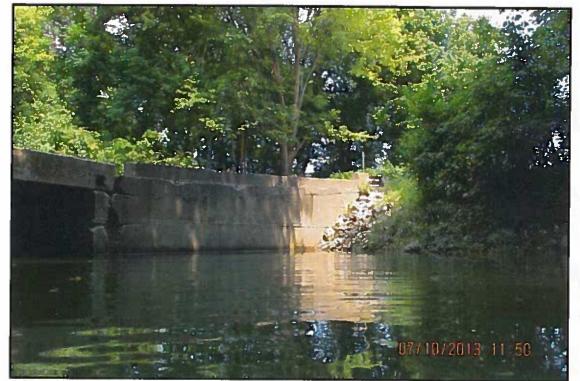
View of Shear Crack above the Water Line on East Wingwall of Abutment 2, Looking West.
